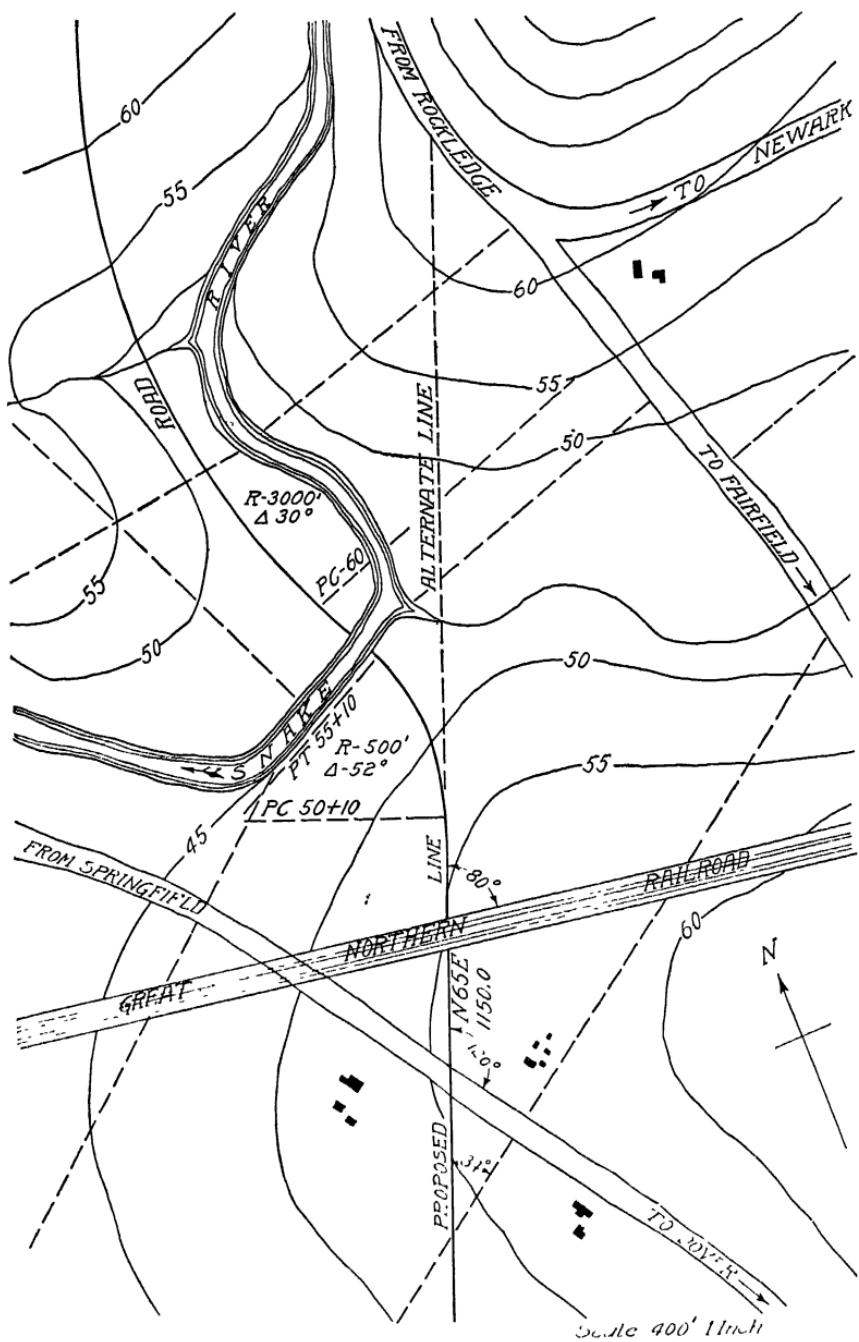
Typical Map Showing Layout in the Region of the Proposed Road
